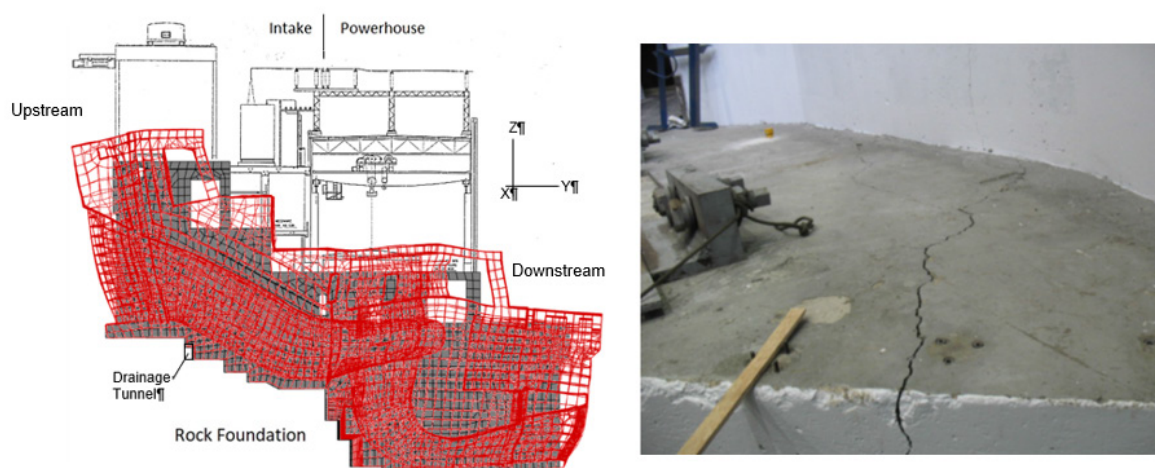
Left: Global deformation of the intake and powerhouse. Right: Example of cracks generated by AAR in the stator's concrete base.
